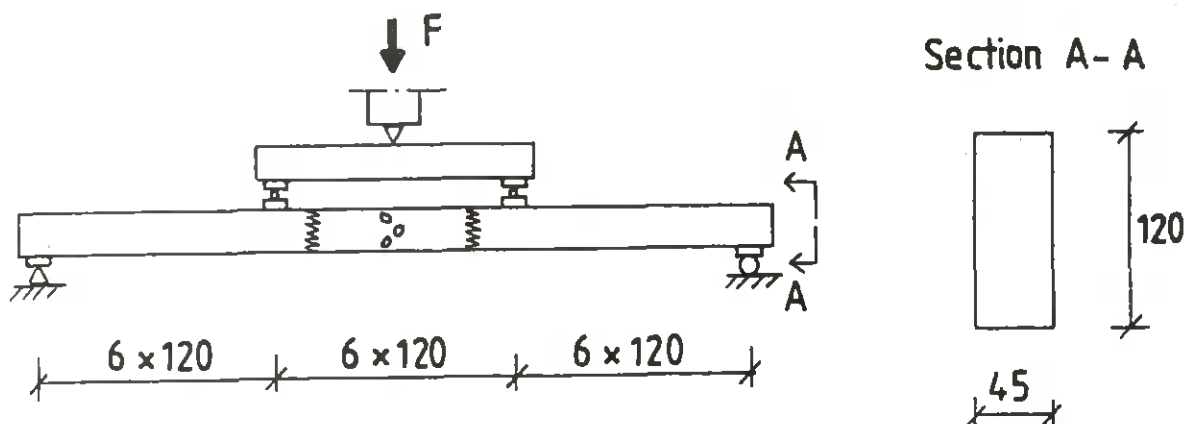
Principal test arrangement when one weak zone was tested at a time. All sizes in mm.
